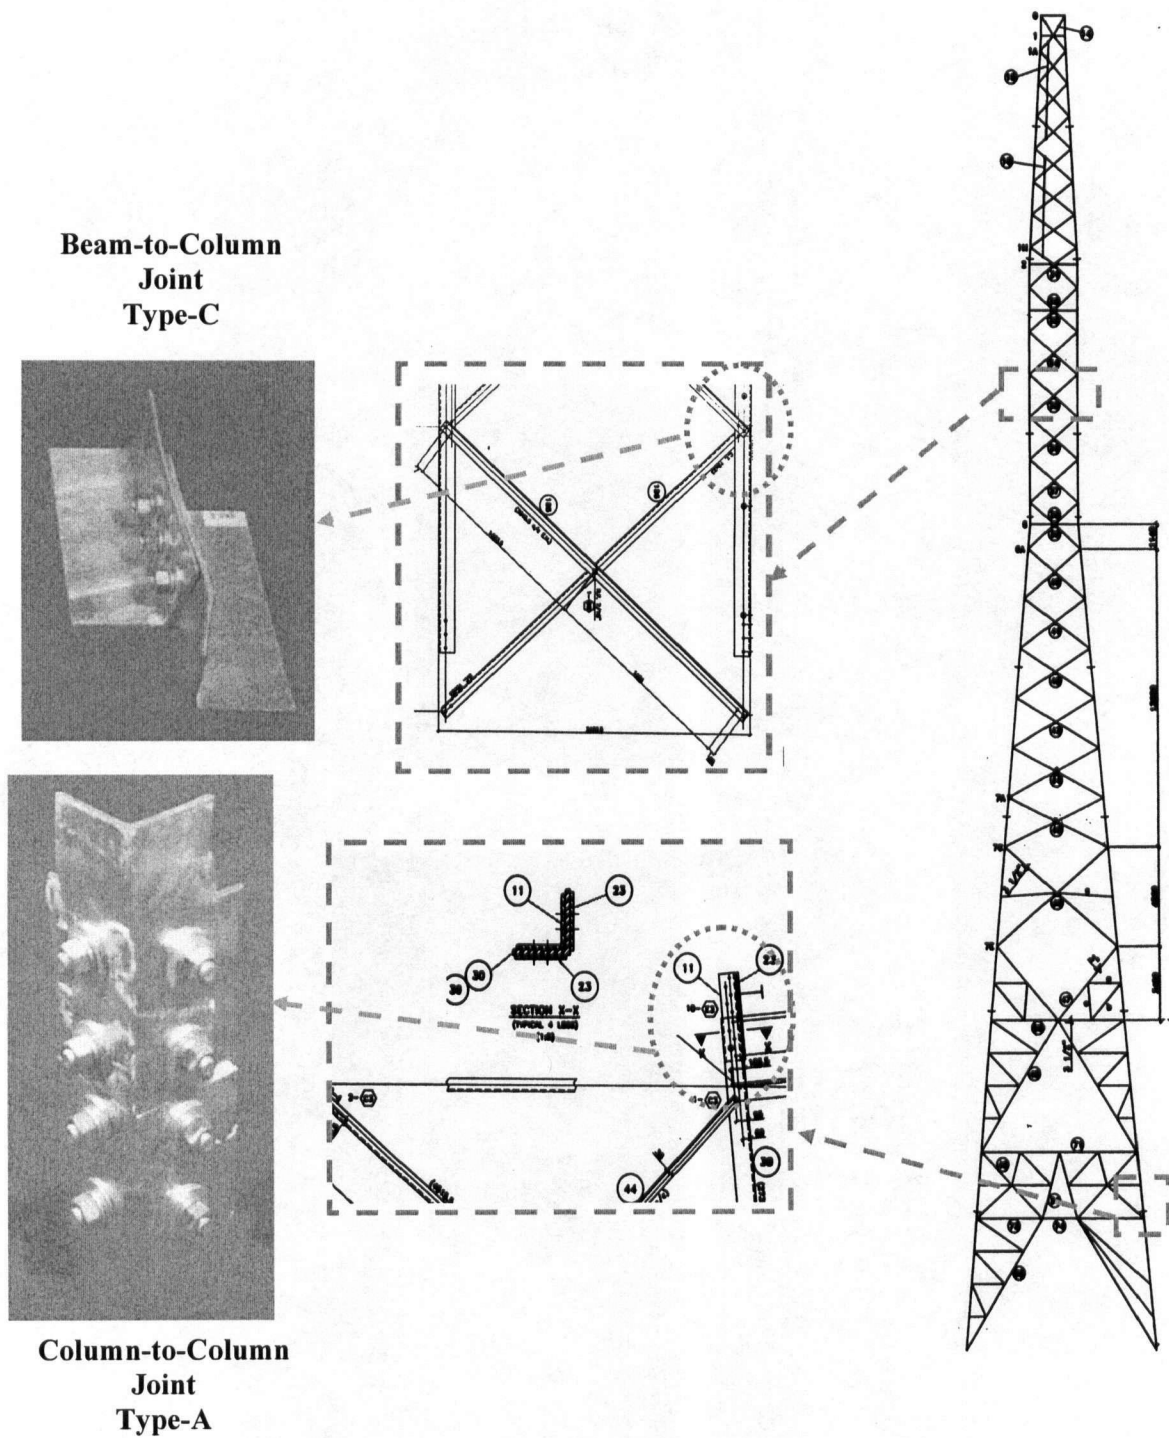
The test specimens and details of the column-to-column and beam-to-column joints.
